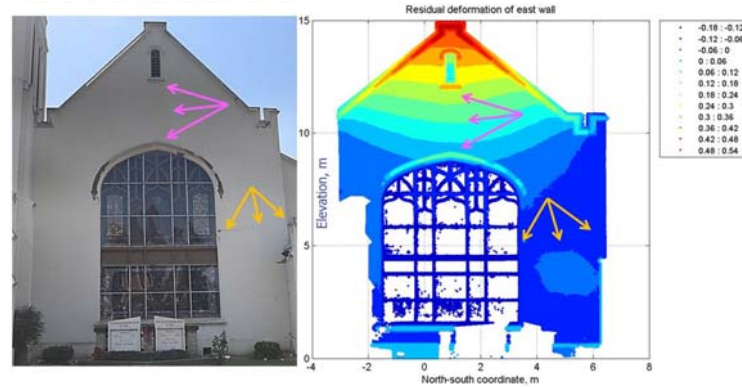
Residual deformations and cracks of east wall of First United Methodist church main building, Napa: photograph (left); point cloud (right).
